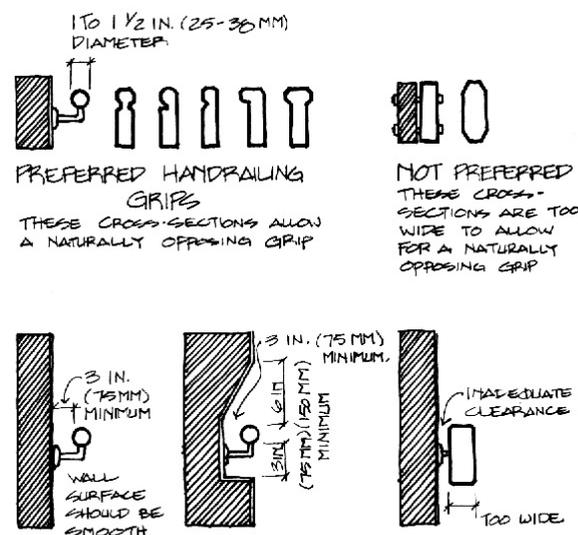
27: Preferred handrail cross sections. The cross section of a handrail should be designed and chosen to allow a firm, prehensile grasp (Source: Harris 1988)
